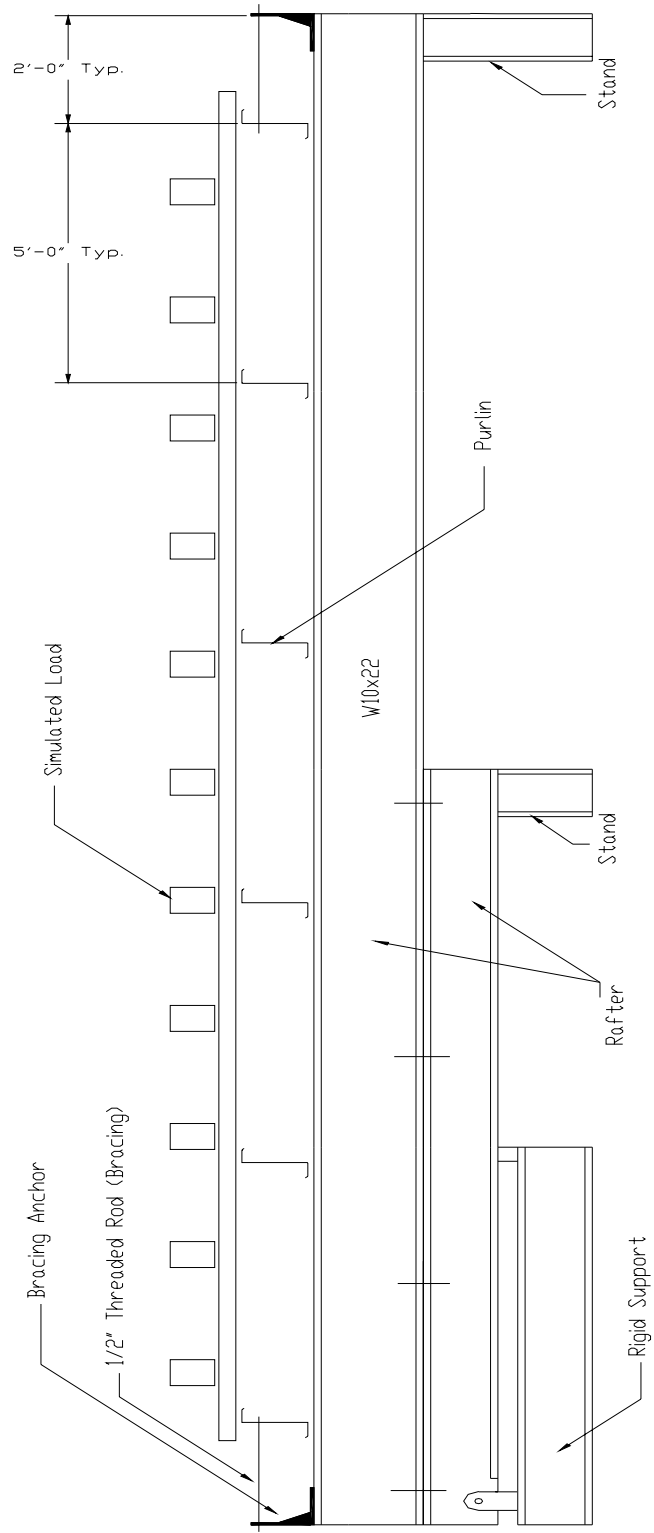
Typical Rafter Support Used for 6 Purlin Line Tests
